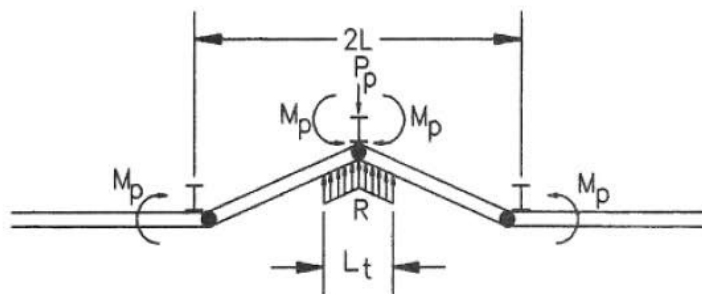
Two-Span Failure Mode for Post-and-Beam Railings
